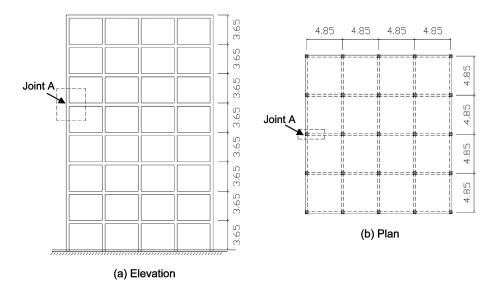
Eight-storey frame building located in the western part of Canada (dimensions in meters; 1 m = 39.37 in)
